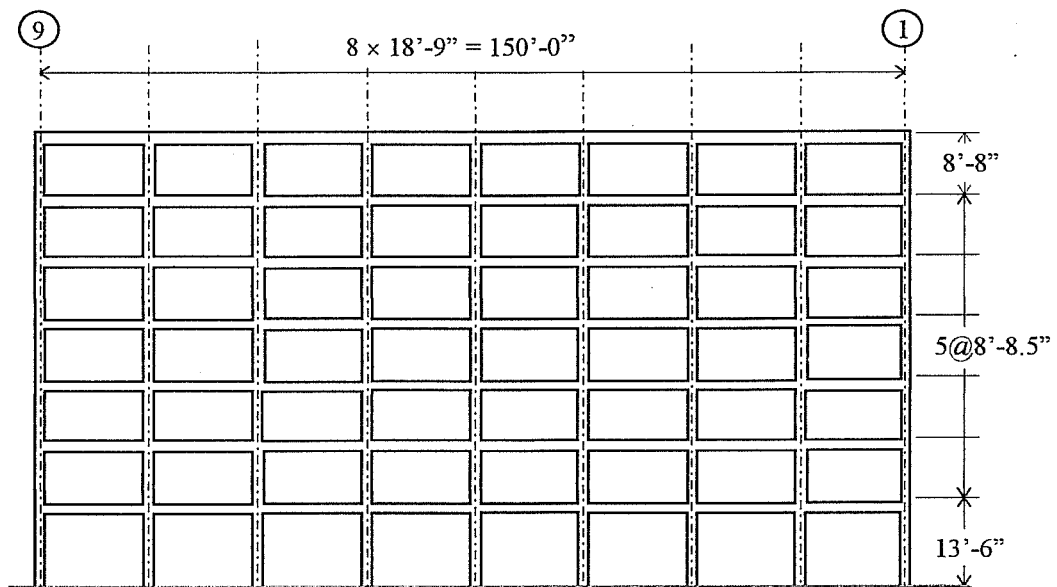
Seven-Story Hotel South Perimeter Frame Elevation
